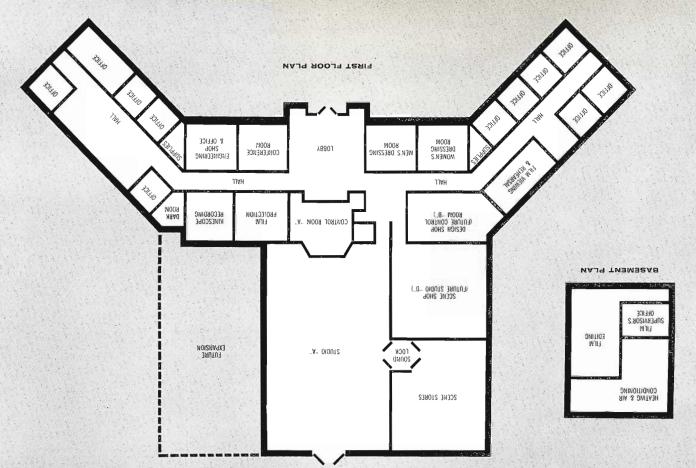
Floor plans of the Baer Memorial Studio, station KETC.
